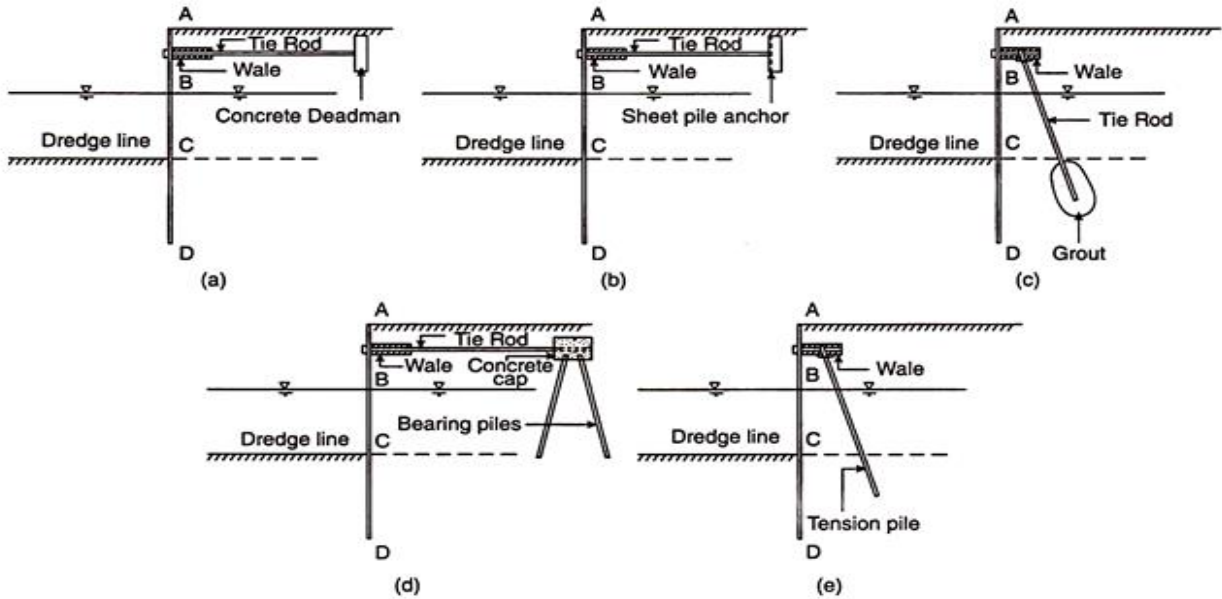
Anchored Cantiliver Sheet Pile Retaining Wall
